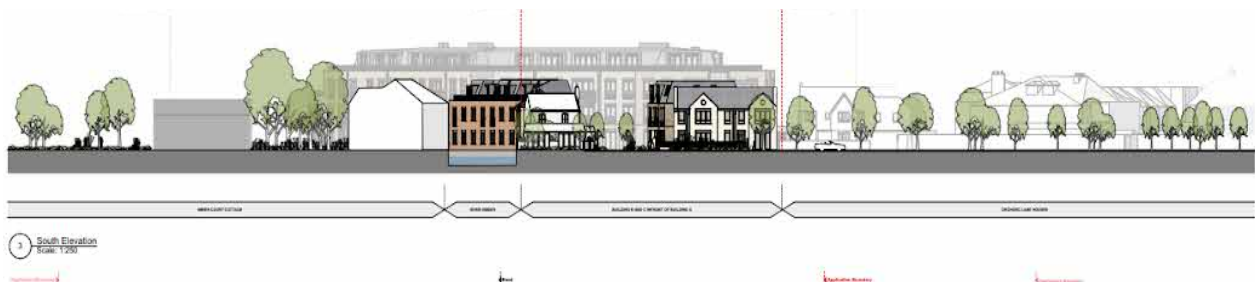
Orchard Lane street Scene Elevation - facing Orchard Lane
